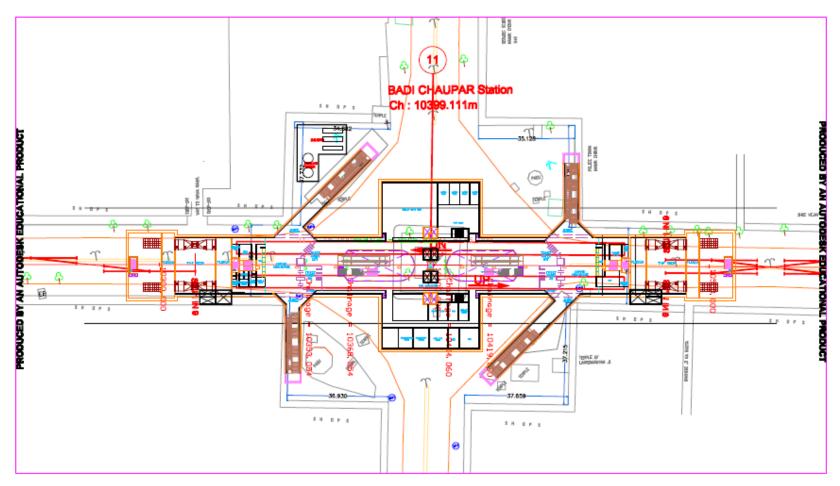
General Layout Plan (Badi Choupar Metro Station)
